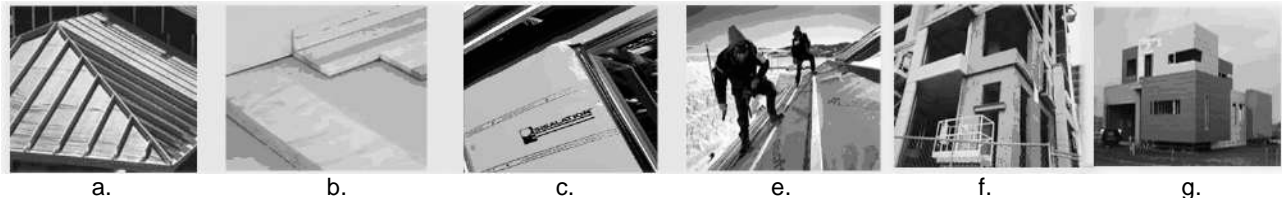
a.-c. Acoustic and thermal insulation: a. in roofs, b. in floor (PE), c. wall (biosoluble glass wool); d.-f. Construction membranes [10]
